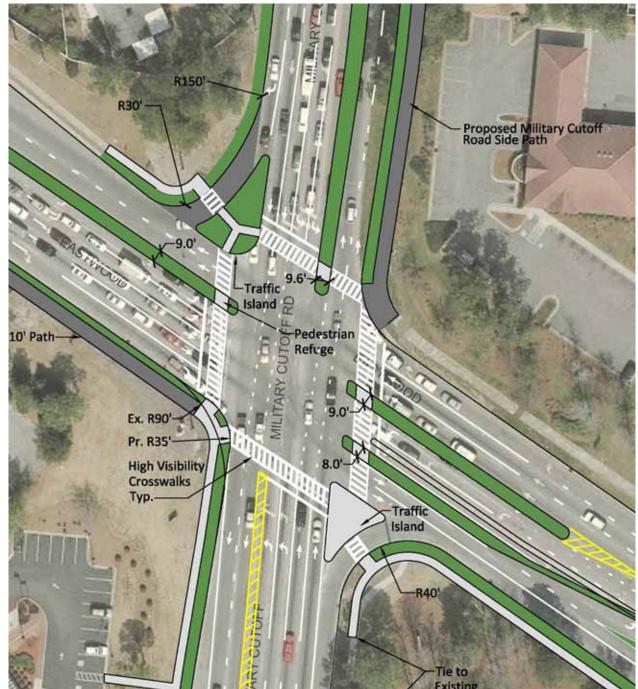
Proposed changes to Military Cutoff Road Intersection with Eastwood Road.
